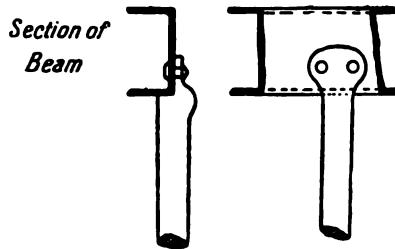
Connection of Pillar Head to Channel Bar Beam.
